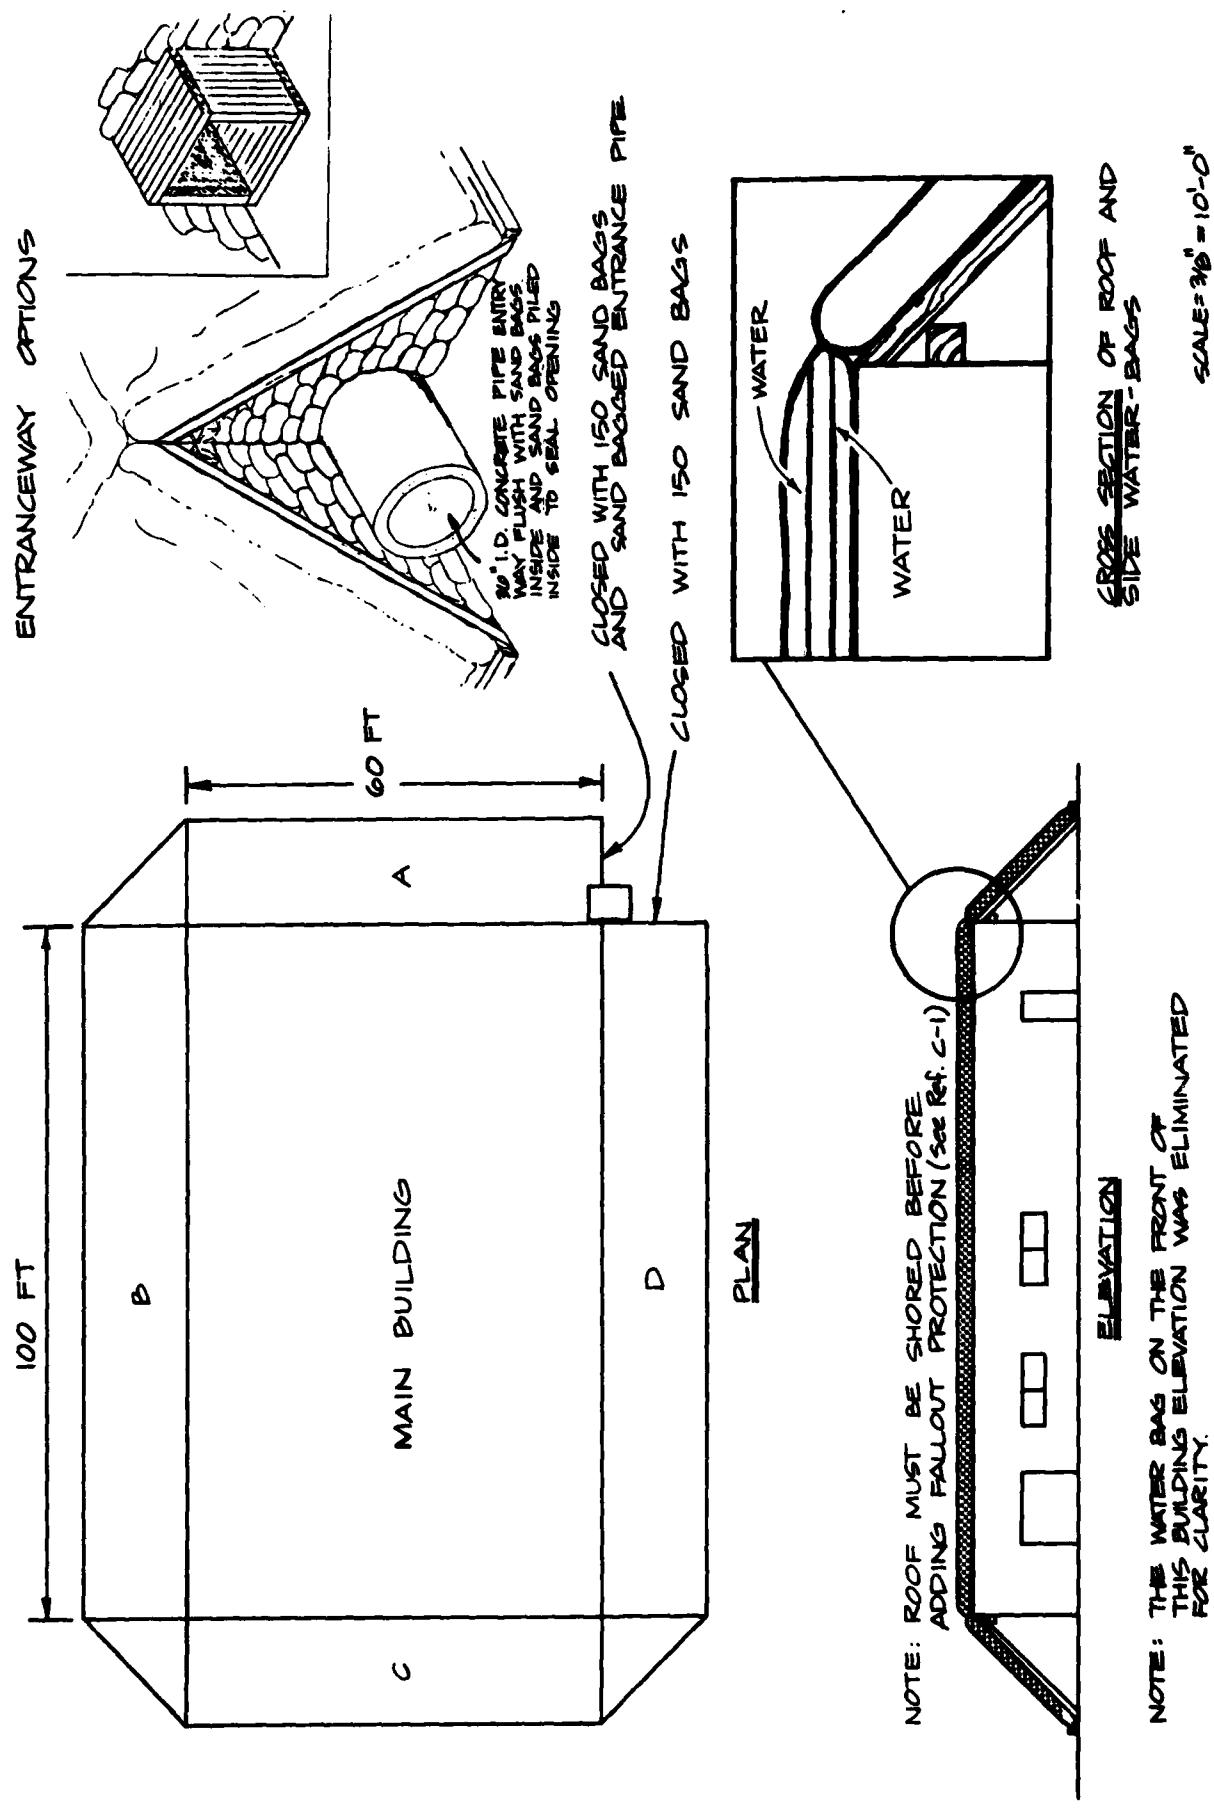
Upgrading of Building to Provide Fallout Protection.
